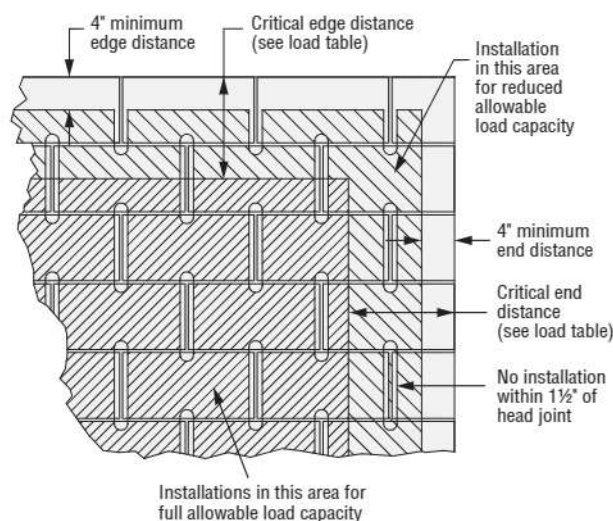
Allowable Anchor Locations for Full and Reduced Load Capacity When Installation Is in the Face of Fully Grouted CMU Masonry Wall Construction
